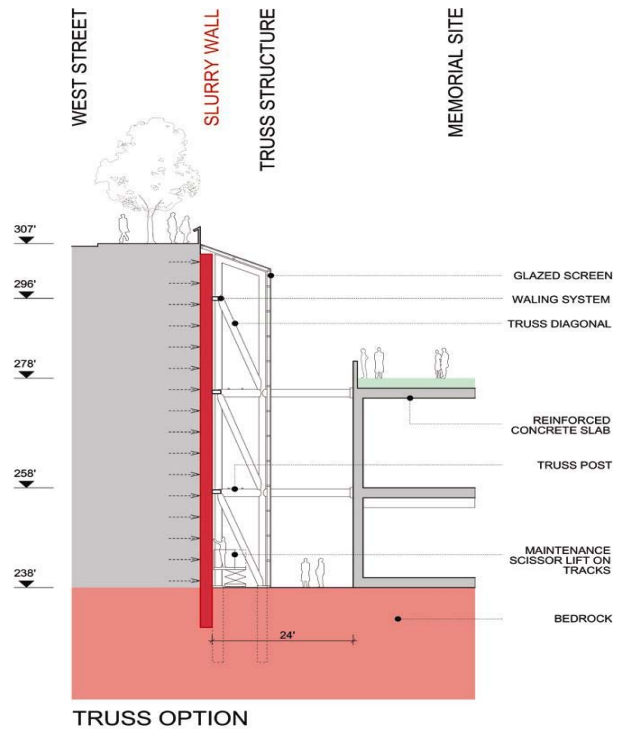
Proposed re-support of slurry wall where wall is to remain visible
